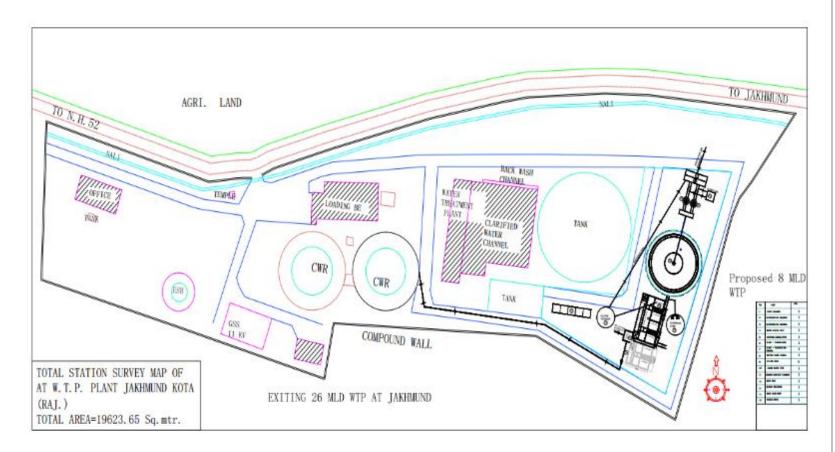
General Arrangement Drawing (GAD)-Water Treatment Plant
